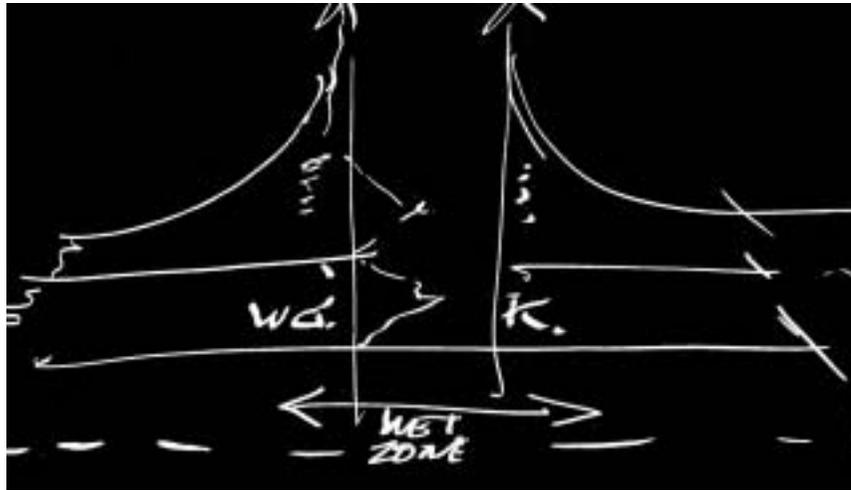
'Wet' areas of the building are located next to or within the earth walls of the central core establishing a 'wet zone'. The built-in ducts within the walls allow for efficient ventilation while the walls themselves aid in absorbing and de-sorbing moisture built up in the air.
